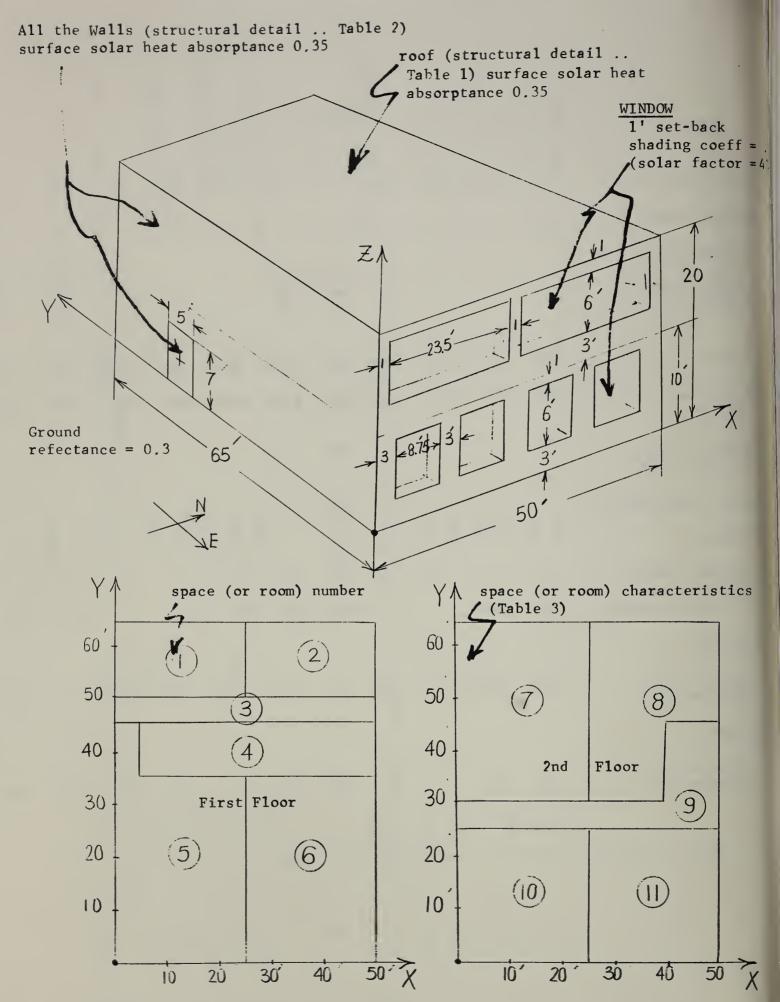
Isometric Line Sketch and Floor Plans of Example Building with Coordinate System, Main Dimensions and Space Numbers
